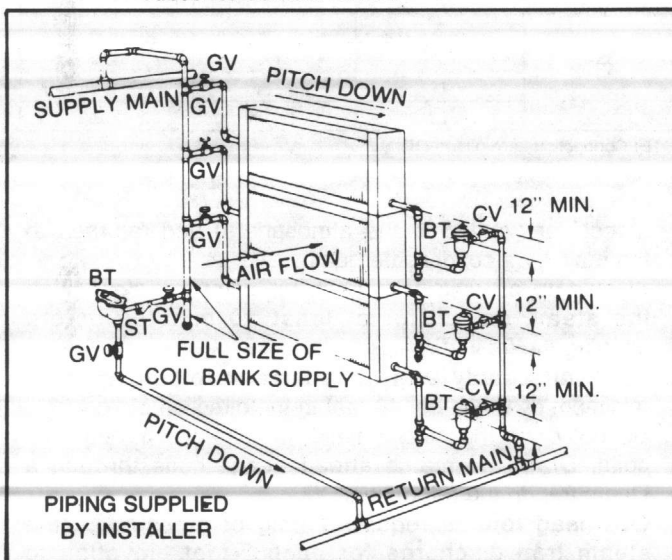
Typical Piping for Type A Steam Coils, High Pressure, Horizontal Tubes for Horizontal Airflow
